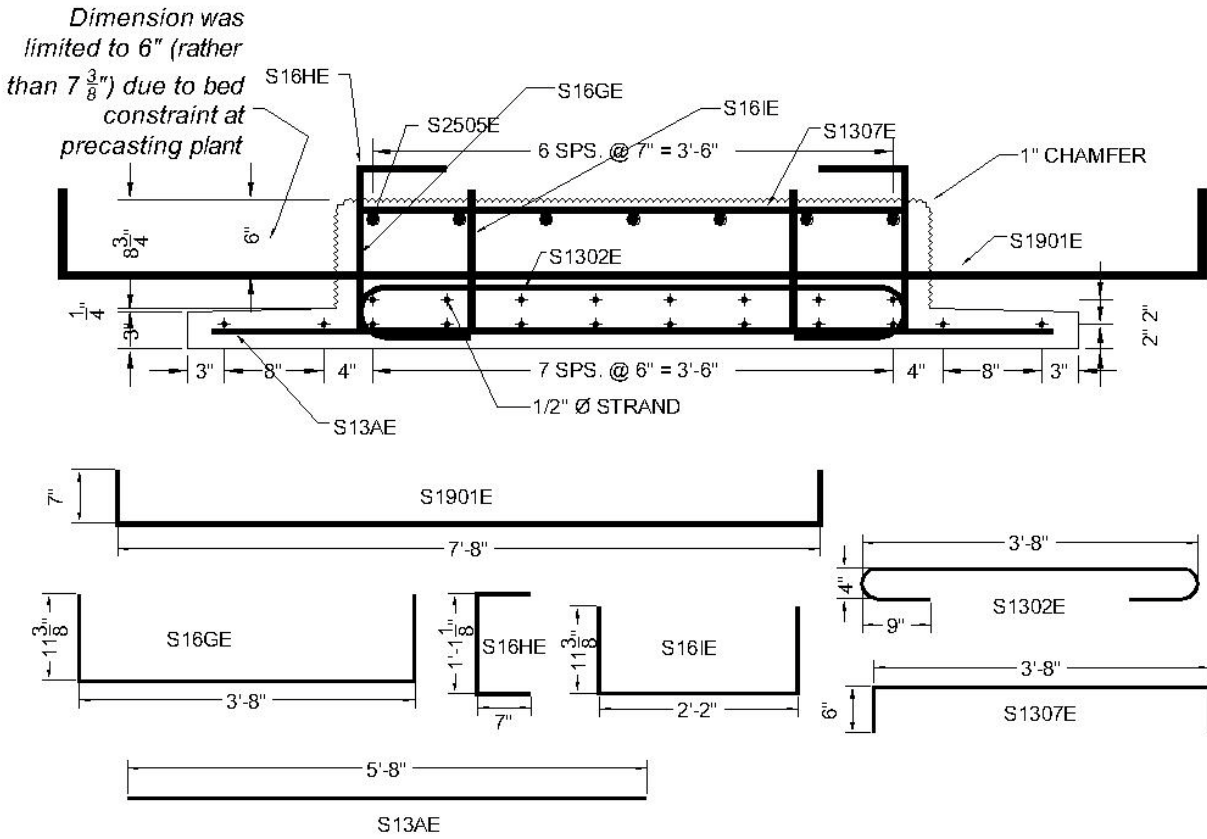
Elevation and plan views of reinforcement layout for precast beam 1N
